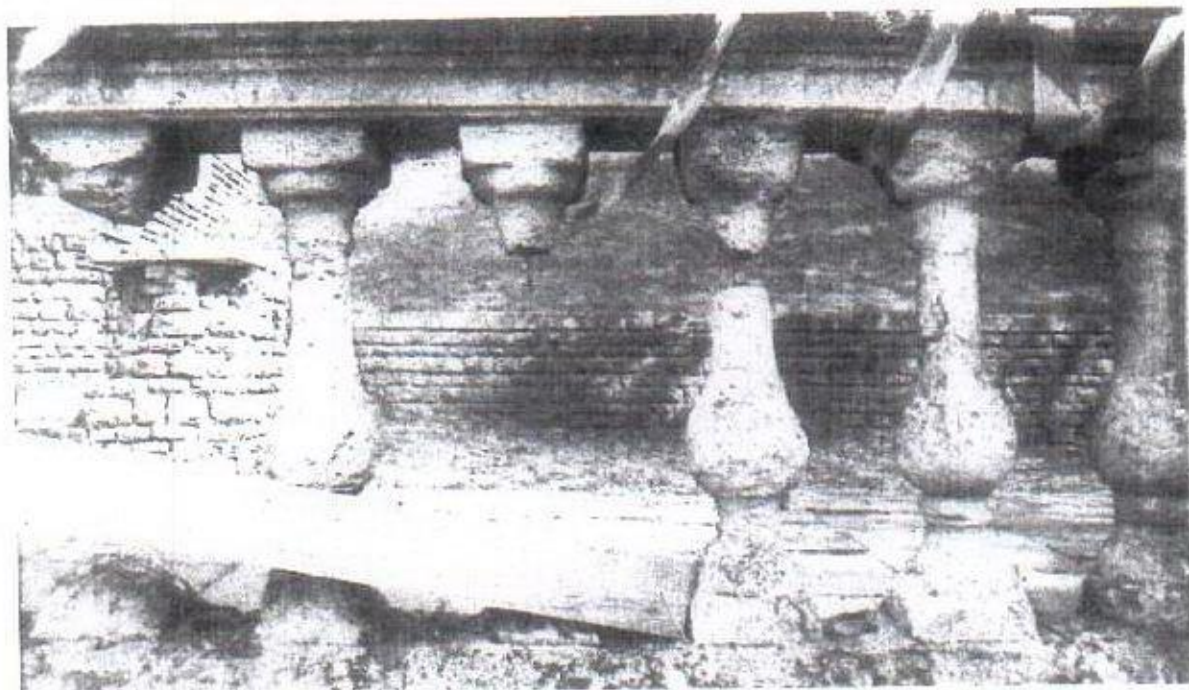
BALUSTRADE TO GRAND STAIRCASE LOWER TERRACE 13
